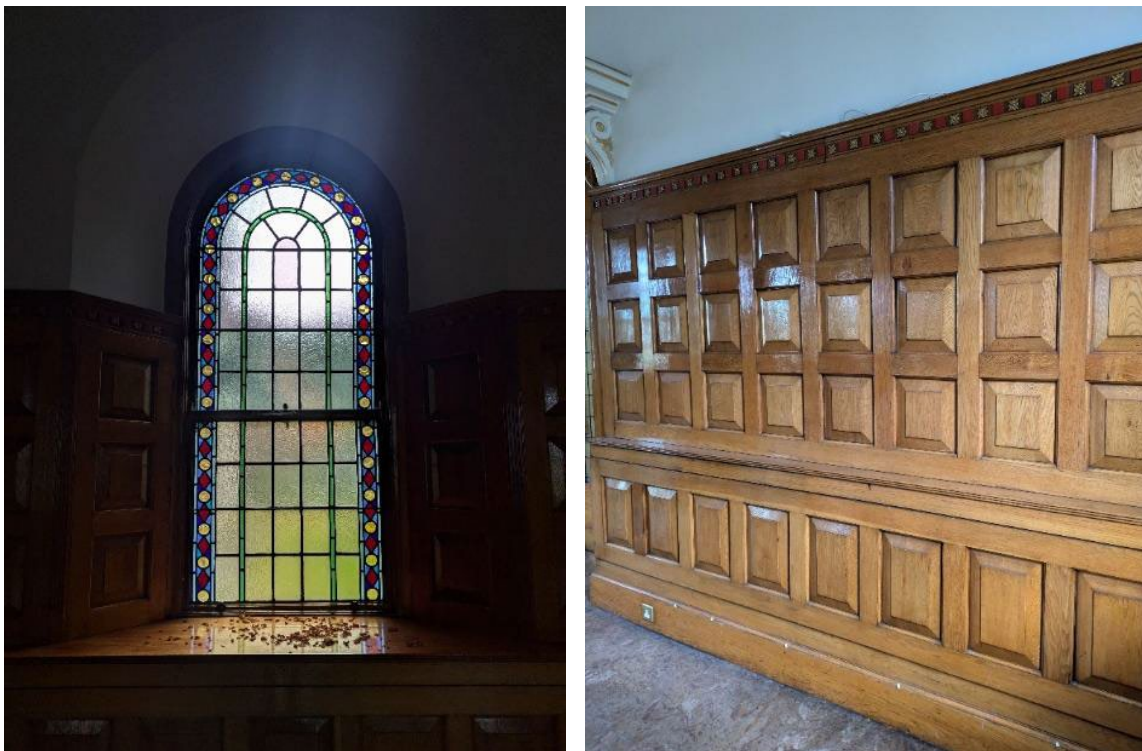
Views of the leaded glazing to the windows (added to the sashes in 1960) and the oak panelling in the Oratory also dating from 1960. These are considered to be of sufficient artistic and architectural interest to merit salvage.
